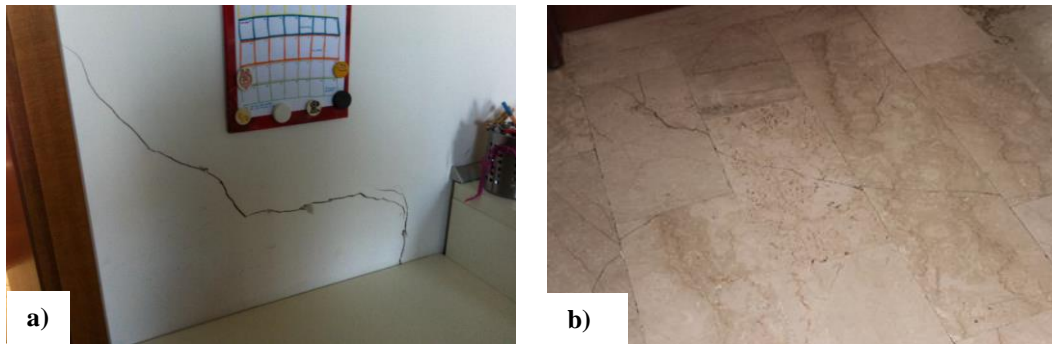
Example of cracks: a) large crack on a vertical wall; b) Diffused crack pattern on a flooring
